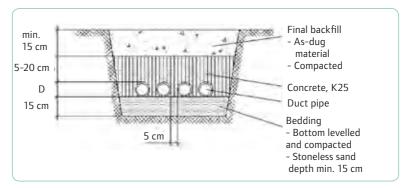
Concrete reinforced sand-embedded cable channel
